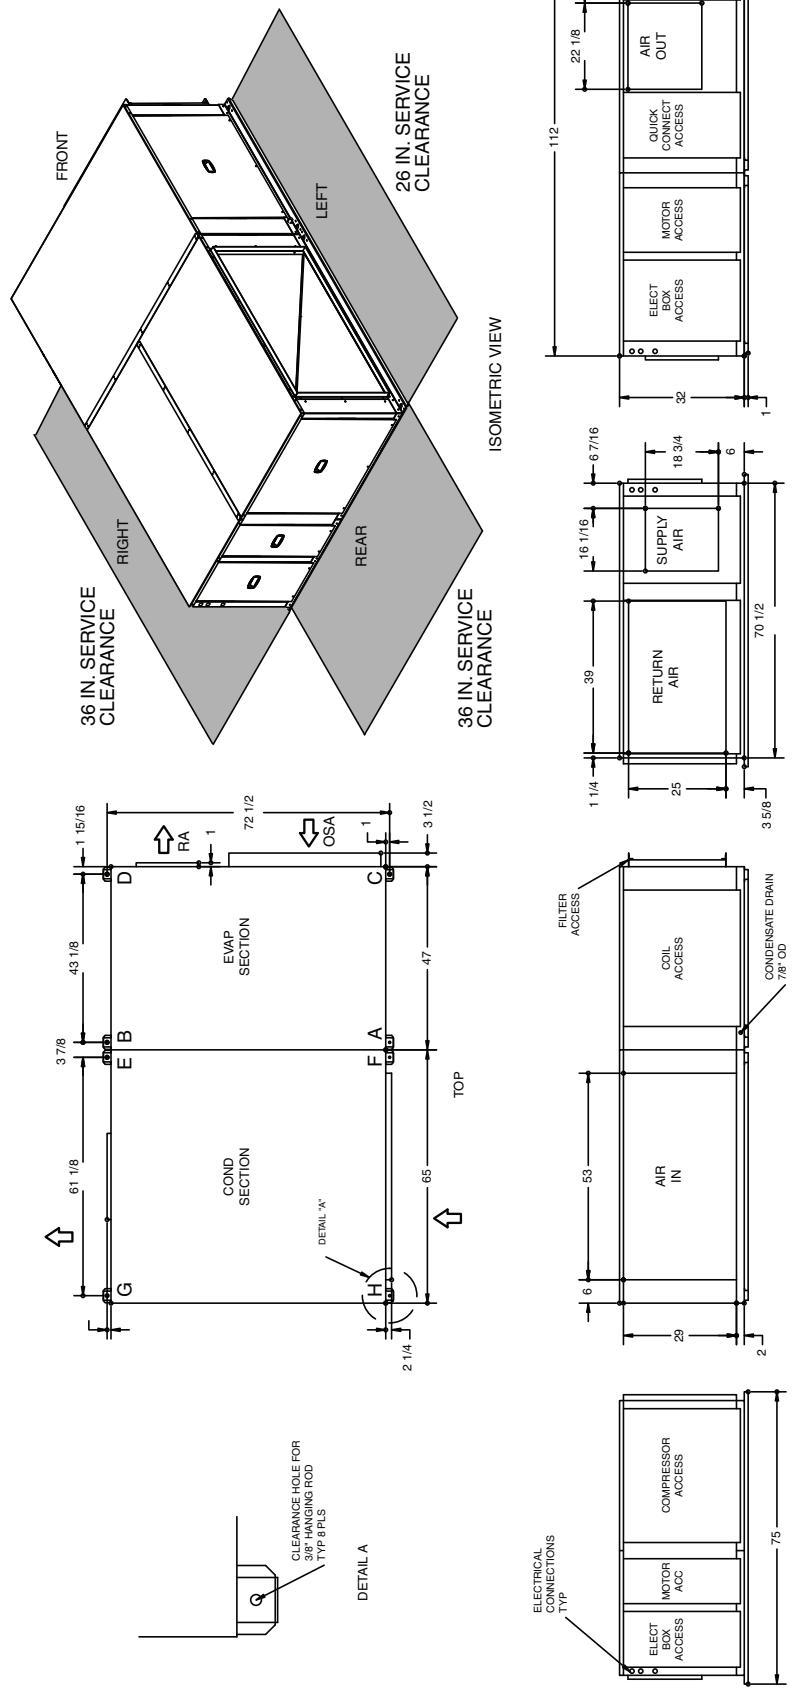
Unit Dimensions — 50AH024-060 Units with Factory-Installed Air-Side Economizer
